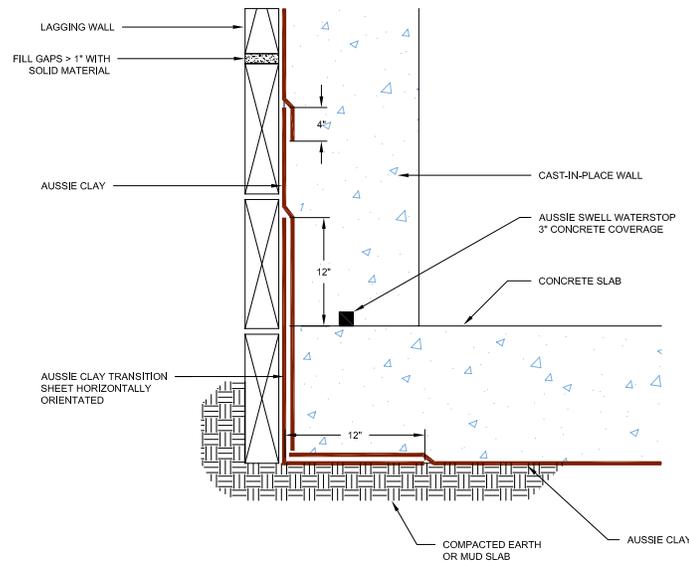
SLAB TO WALL TRANSITION OVER LAGGING
